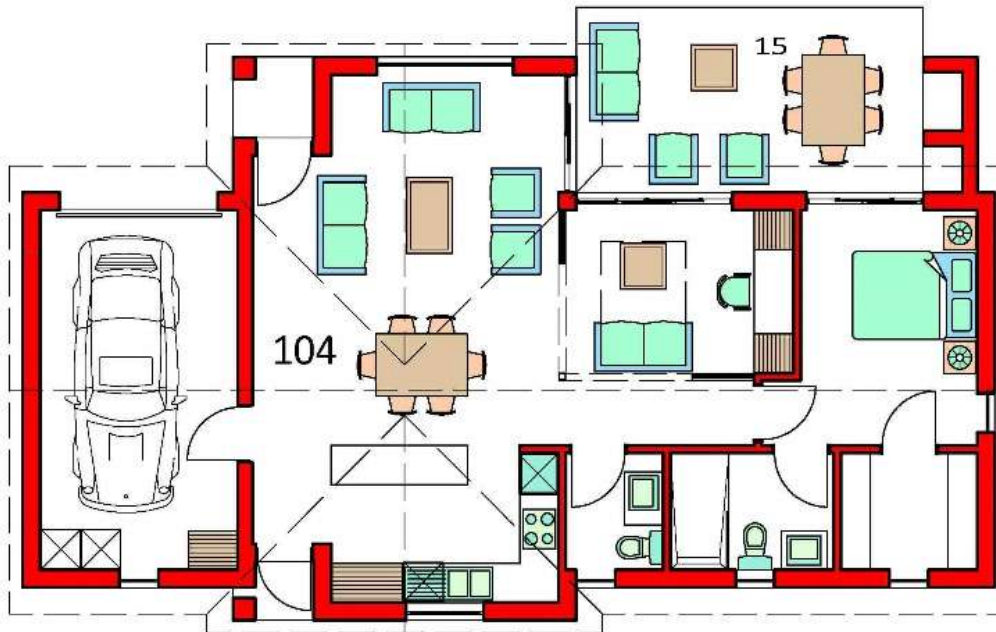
Floorplan of variation – north entry (Type A) 104m².
